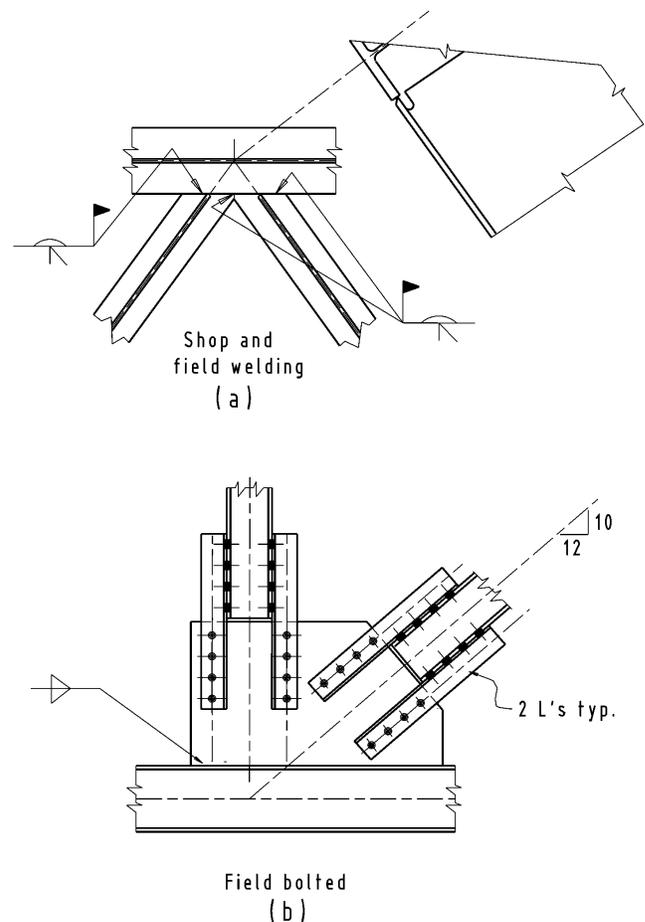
Construction of heavily loaded trusses consisting of W-shapes for both chord and web members.
